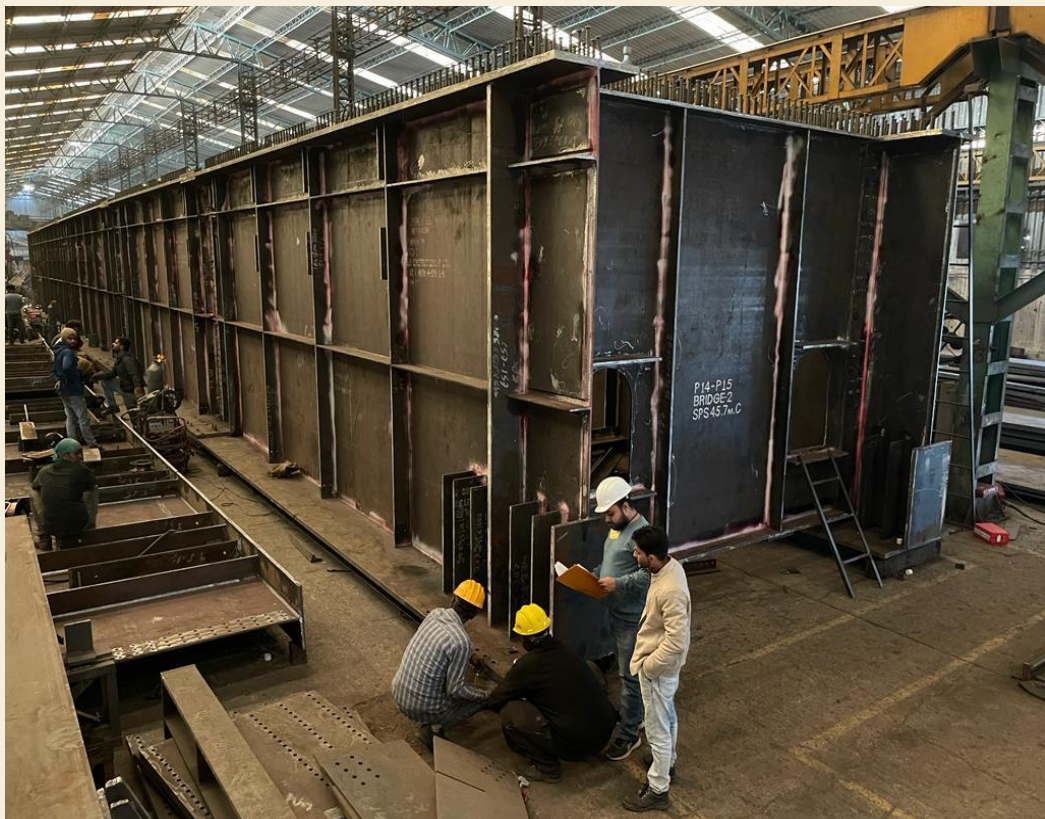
Trial Assembly Inspection of 45.7m Bridge span for RVNL Bhanupalli- Bilaspur-Beri New Rail Line
